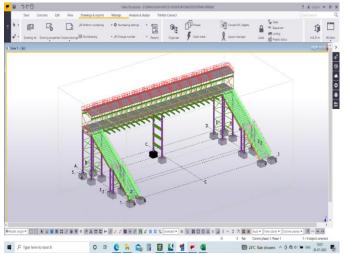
Modeling of Cold Formed Steel Bridge in Tekla Str.
